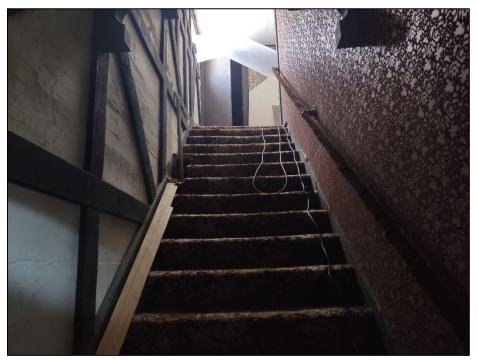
July 29, 2024. Upper Floor Roofing Spill. Containment was installed at the entrance to the storage room at the top of the stairwell. On the floor of the storage room is asphalt roofing mixed in with paper insulation. Negative air was installed with venting out of a HEPA filter discharged out a second story window.
